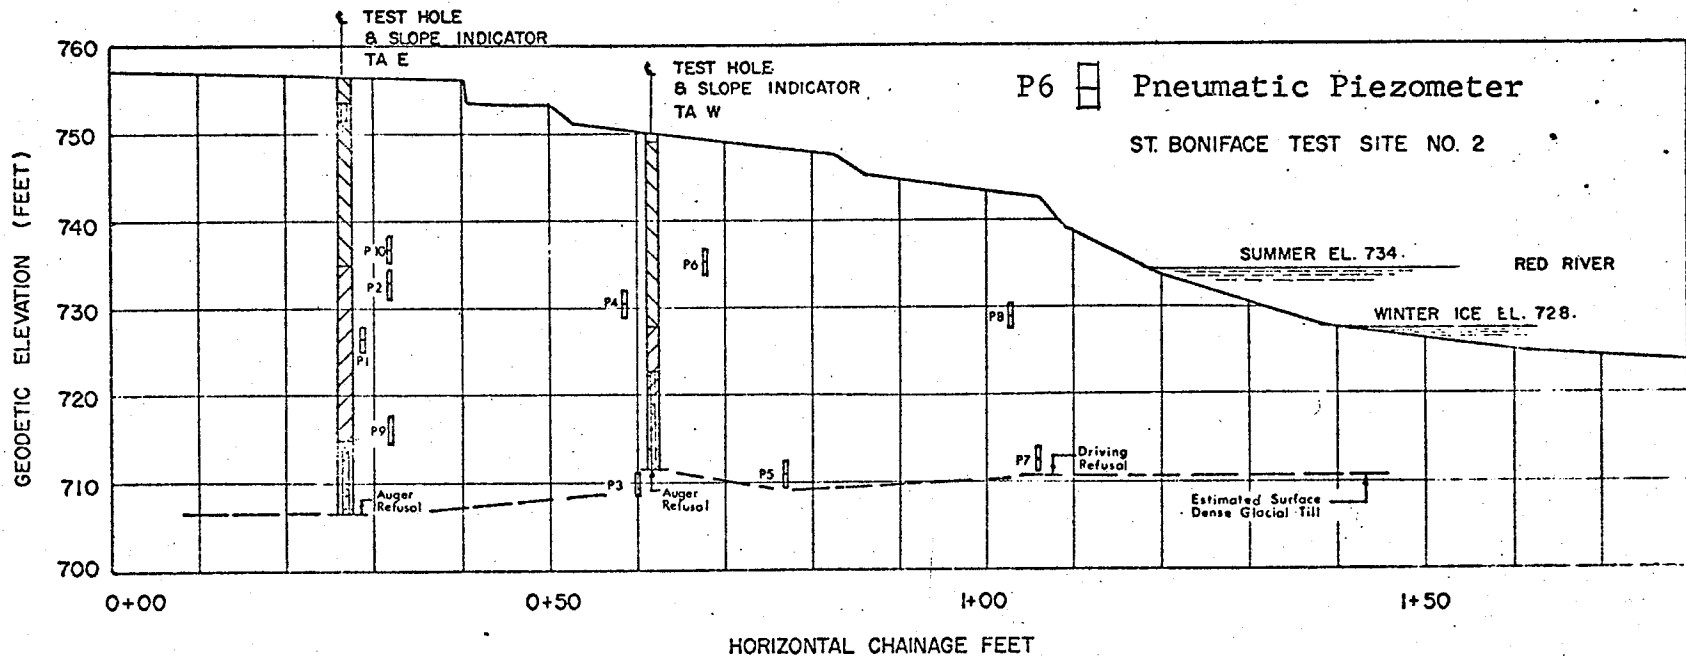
BANK CROSS-SECTION, TEST HOLES, INSTRUMENTATION
